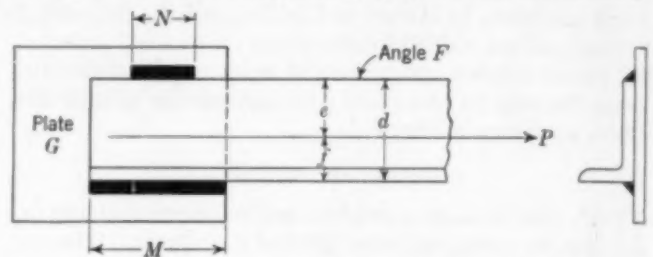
LAP JOINT WITH LONGITUDINAL FILLETS CONNECTING ANGLE F TO PLATE G
